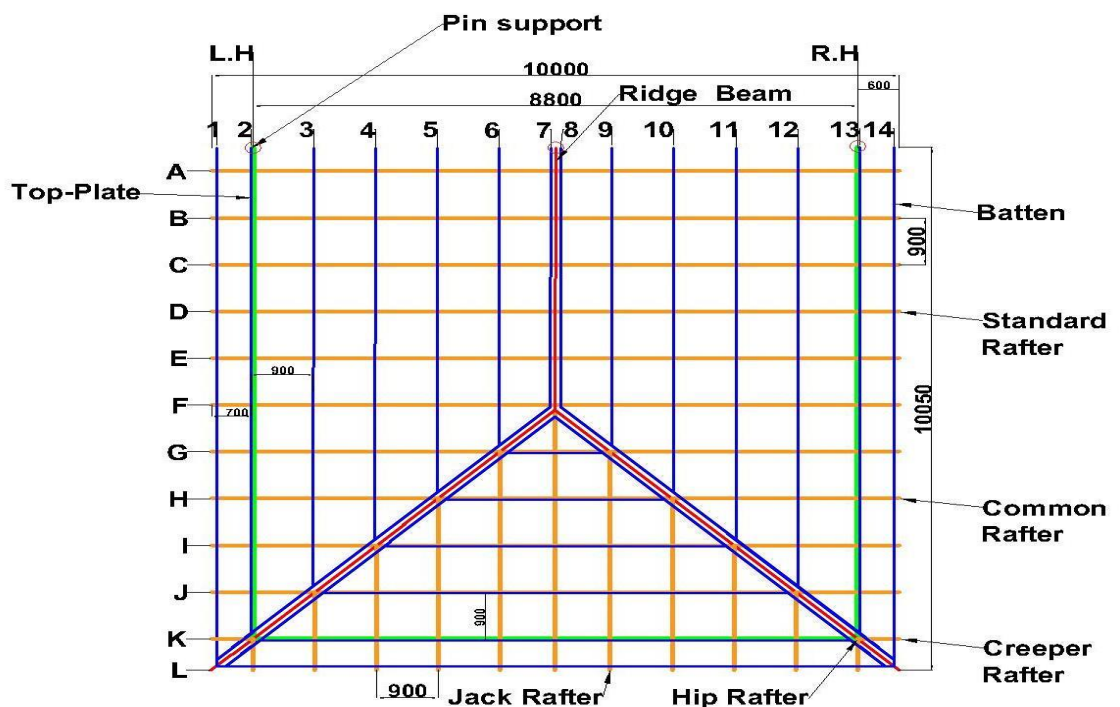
PLAN VIEW OF TYPE 1 FEM
